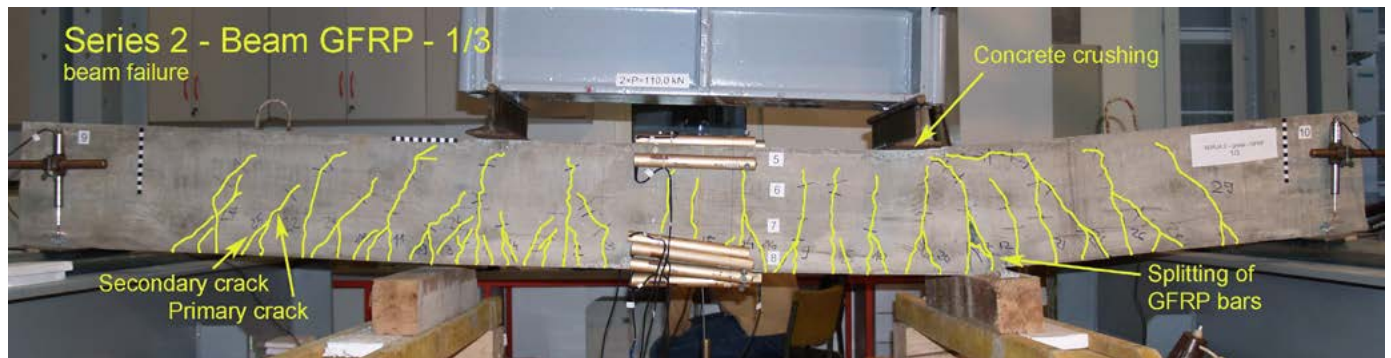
Crack pattern for beam reinforced with GFRP at failure
